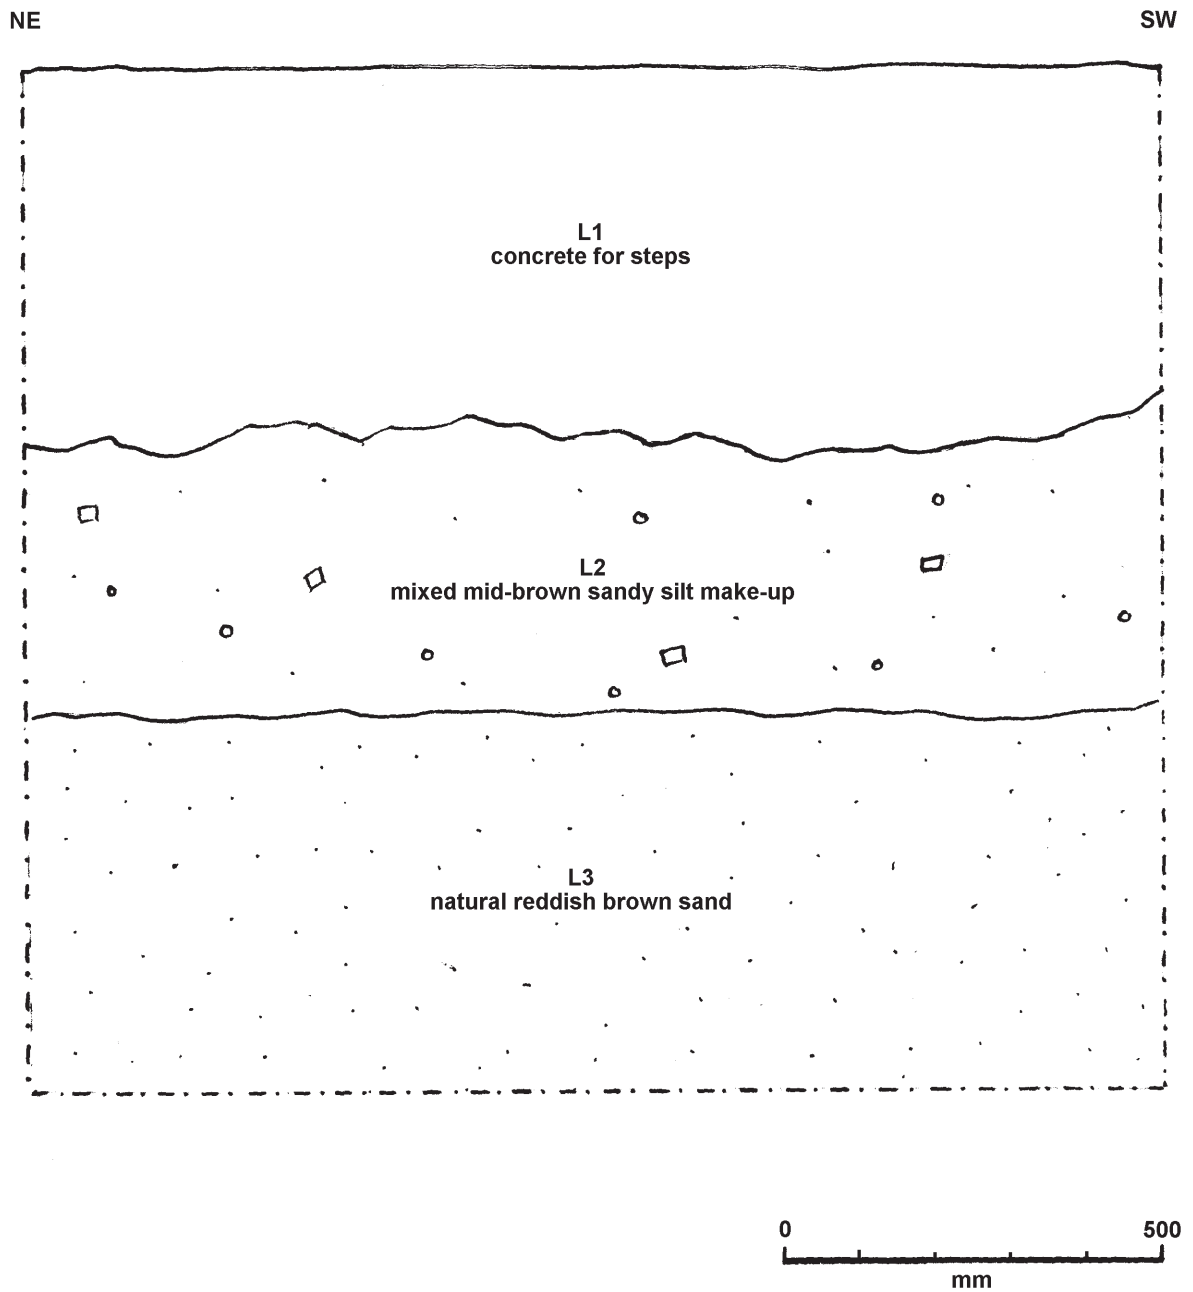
Drawing of south-eastern section of foundation trench, scale 1:10.
